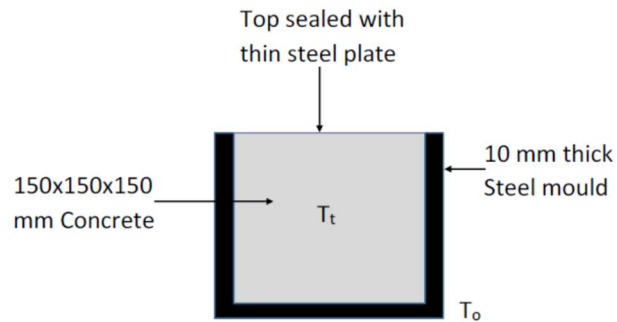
Specimen geometry, dimensions, and boundary conditions
